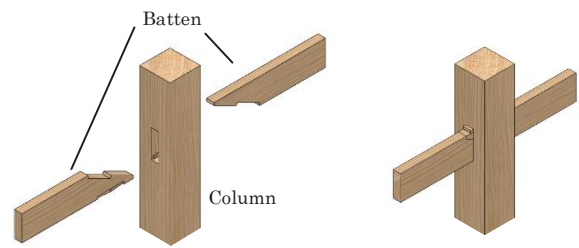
Details of Nuki joint (linear layout) ^{注5)}
